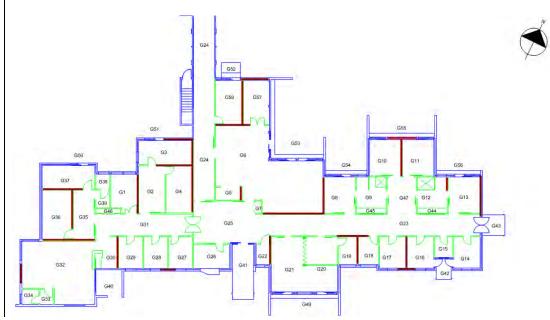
Proposed Strengthening Scheme – Plywood Lined Walls
